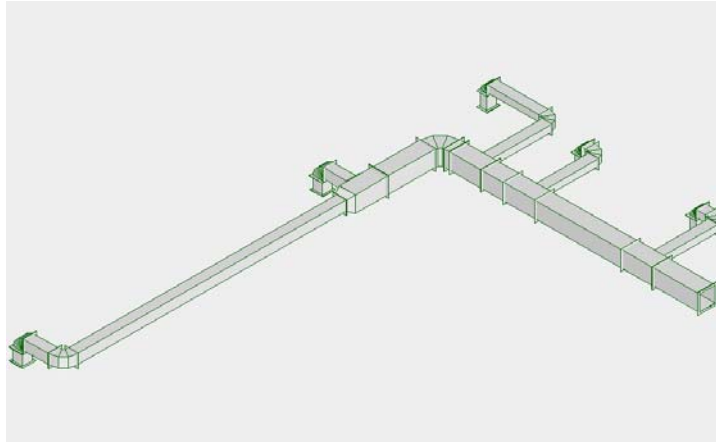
HVAC layout Ground Floor (as imported from IFC file)
